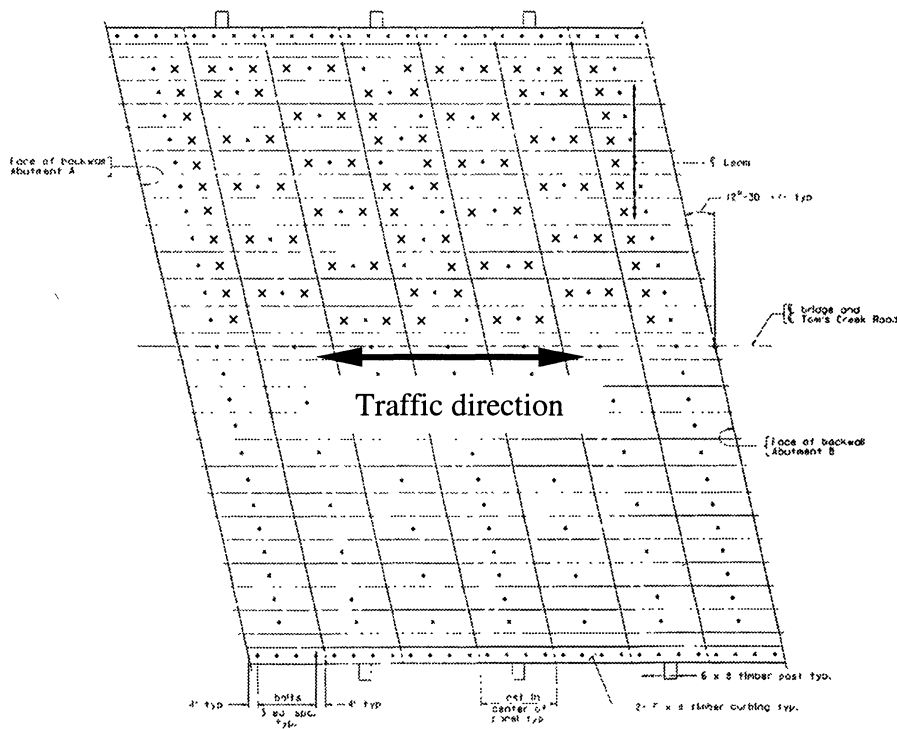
Two different connection sets utilized in the laboratory bridge testing. The first (single) connections are designated by dots; the additional connections (forming the second connection set) are designated by X's.
